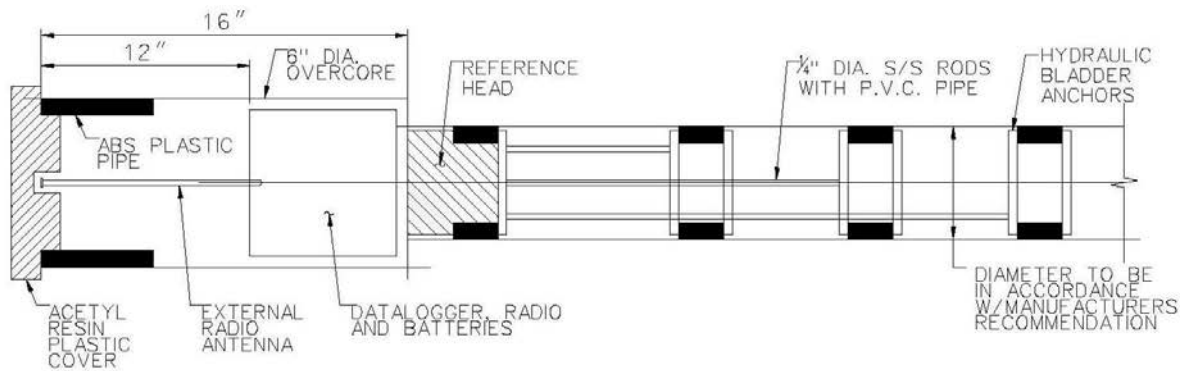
Horizontal Borehole Extensometer Installed from Advancing Excavation
